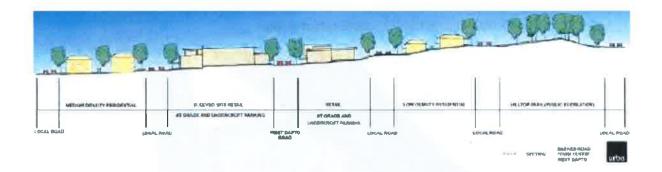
Darkes Road Town Centre – Conceptual Cross section
